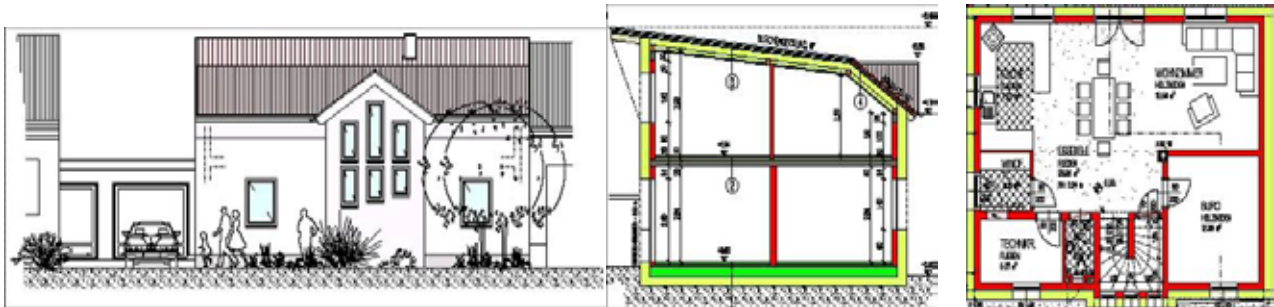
Construction plans for the detached family home. All red marked walls are unfired loam brick walls.
